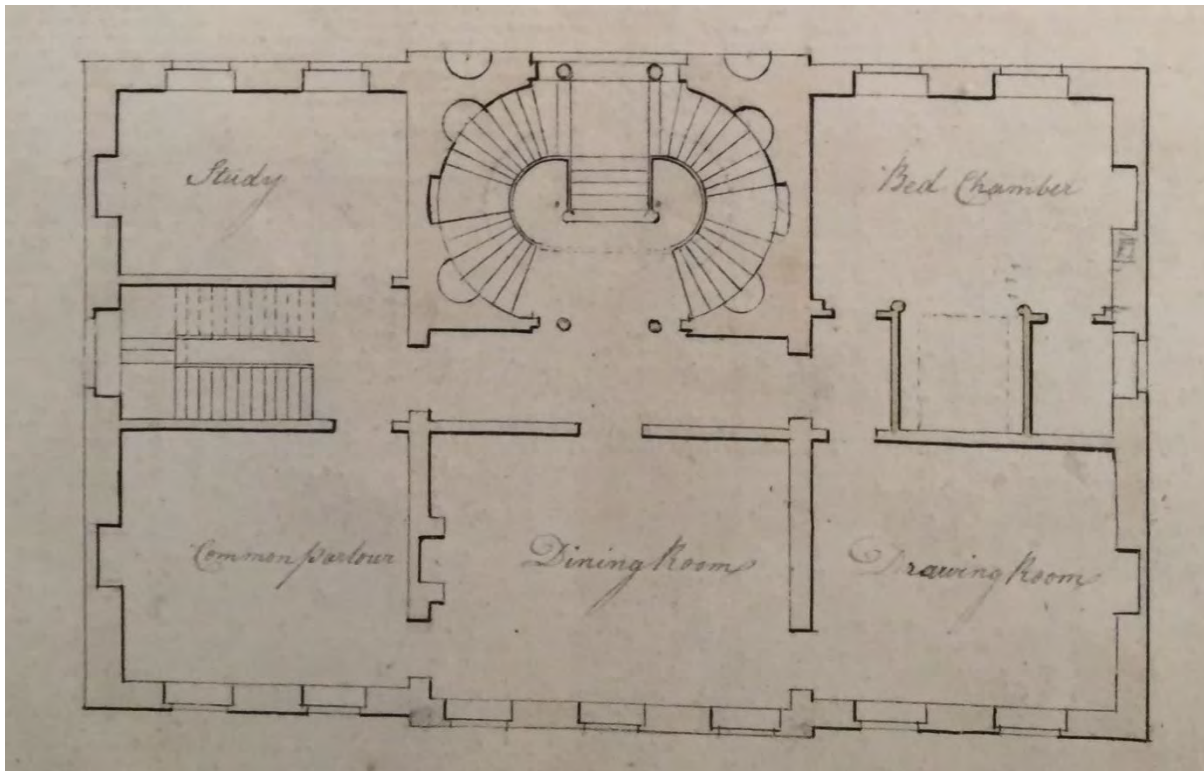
Plan of the first floor at Platt Hall (c.1761) (Manchester City Art Galleries: M/c CAG:1961.165A: Floorplans of Platt Hall by Timothy Lightoler, 1761)
